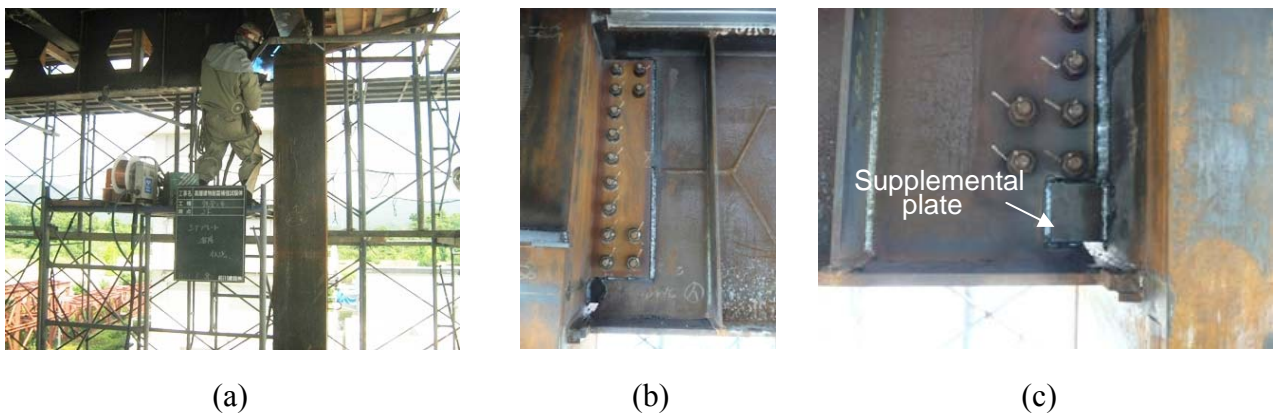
Connection with modified supplemental welds: (a) Welding situation; (b) Supplemental welds; (c) Modified supplemental welds
